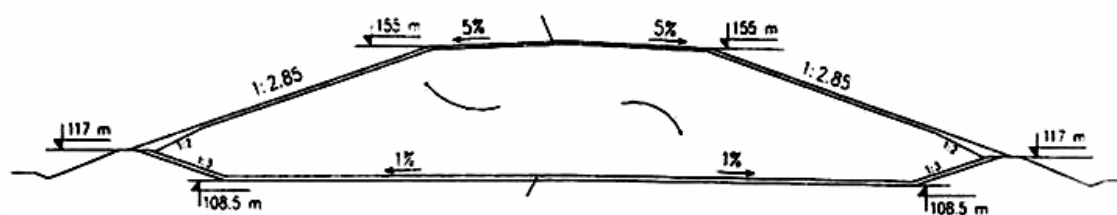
Typical cross section of the sanitary landfill Jakusevec.
